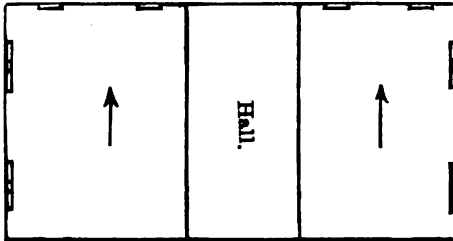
Schenectady, Park Place. Facing light, needlessly.
